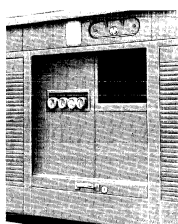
Switch terminals can be designed to meet any requirements. The accompanying illustration shows a switch terminal built in under a counter.
